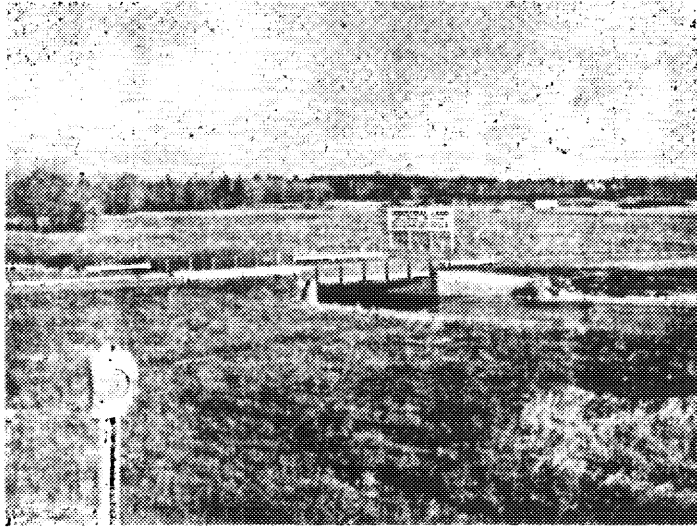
HAMPSHIRE ROAD BRIDGE
